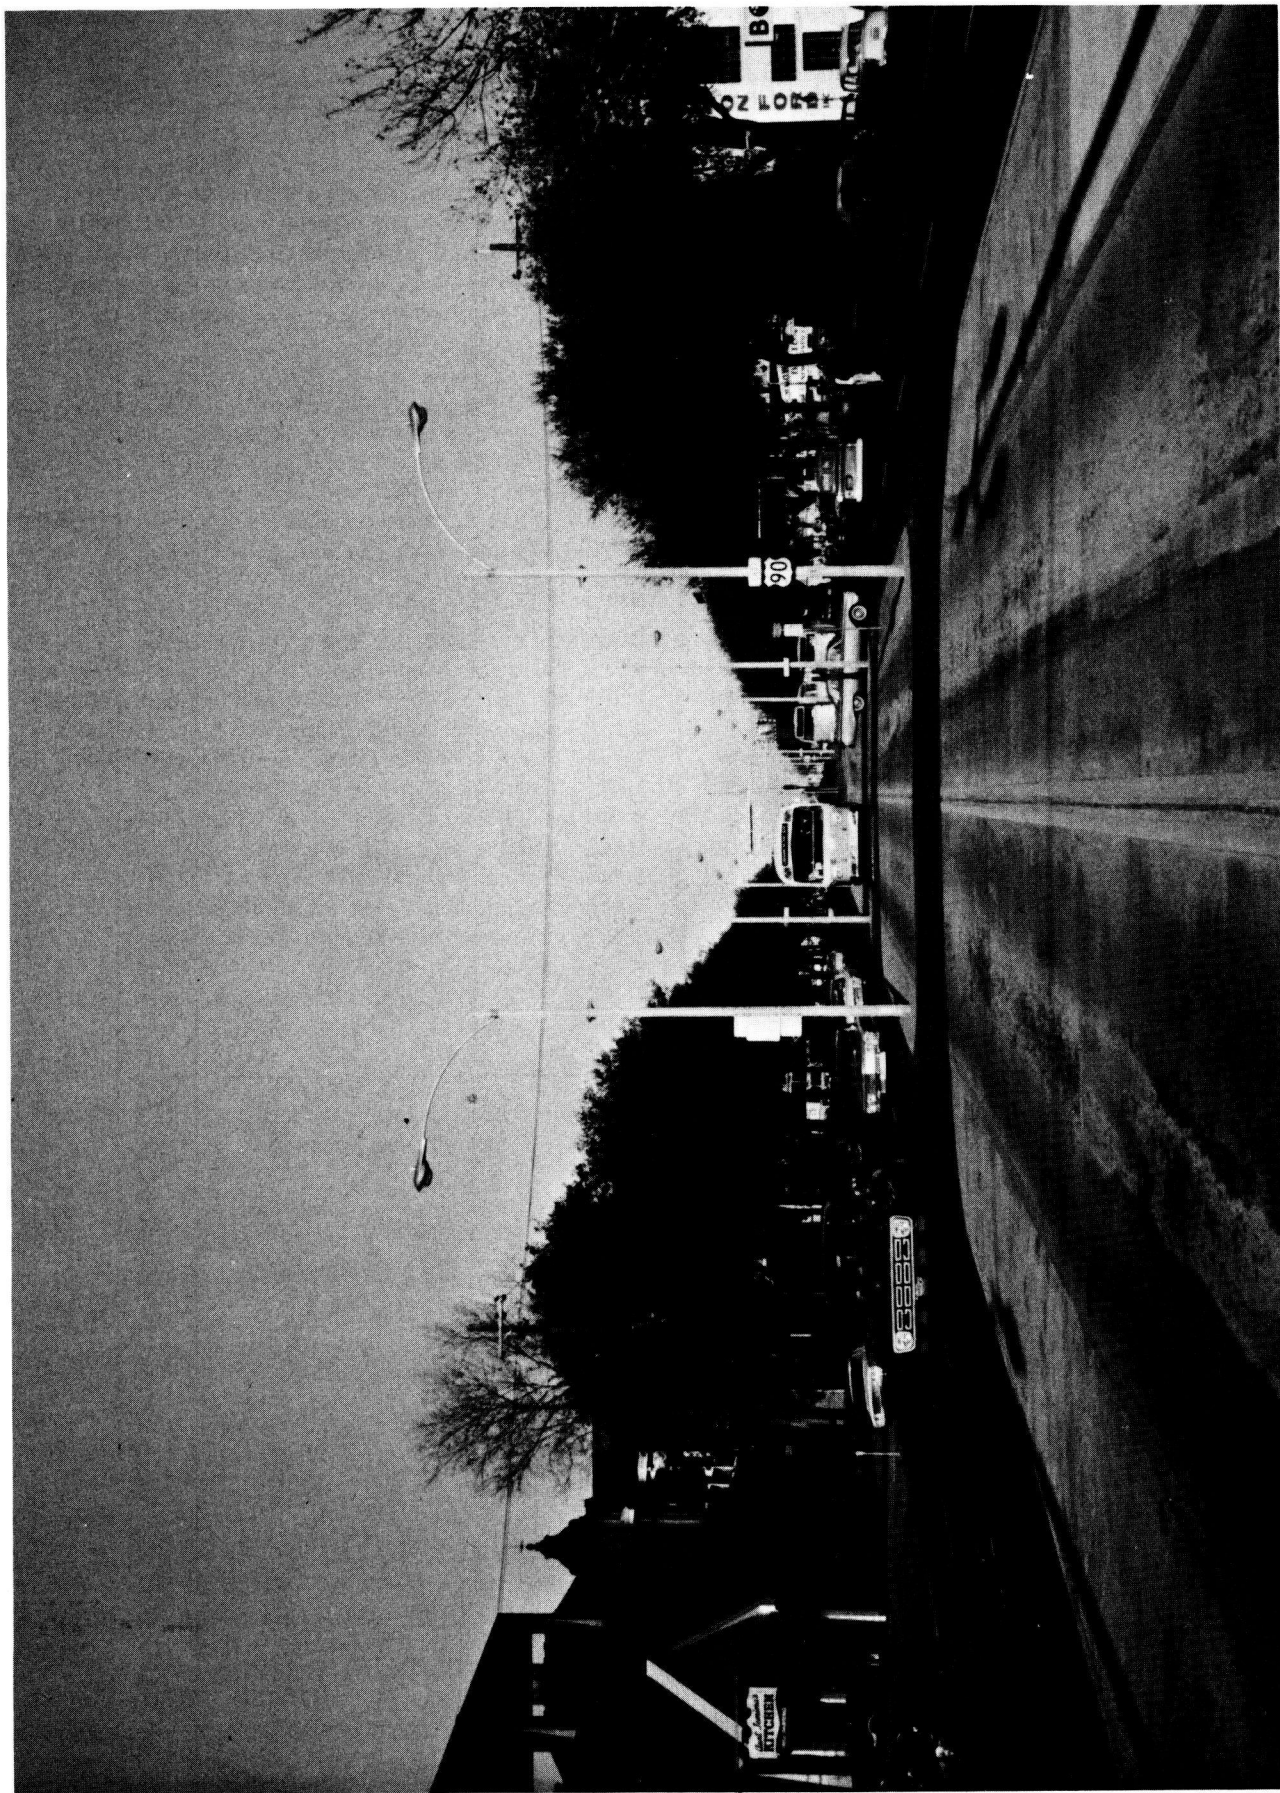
Typical view, Canal Street busway, New Orleans, La.
